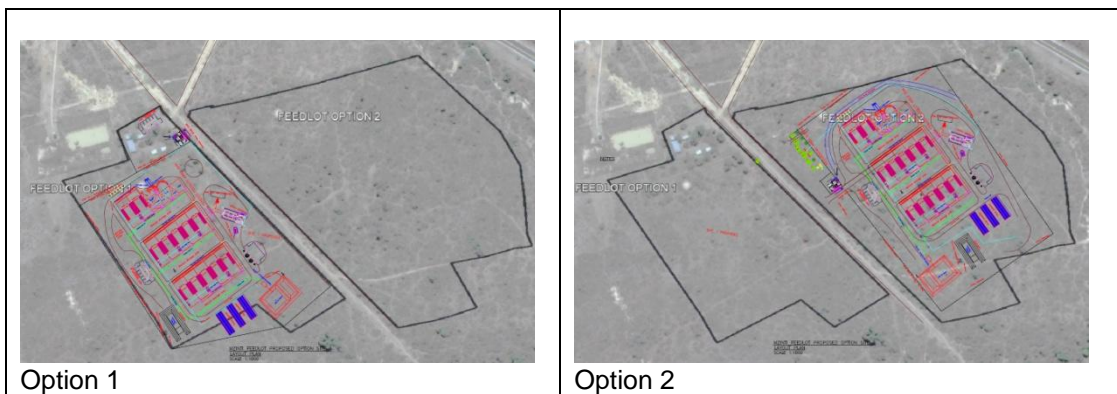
Layout of the proposed development – indicated on the alternative sites
